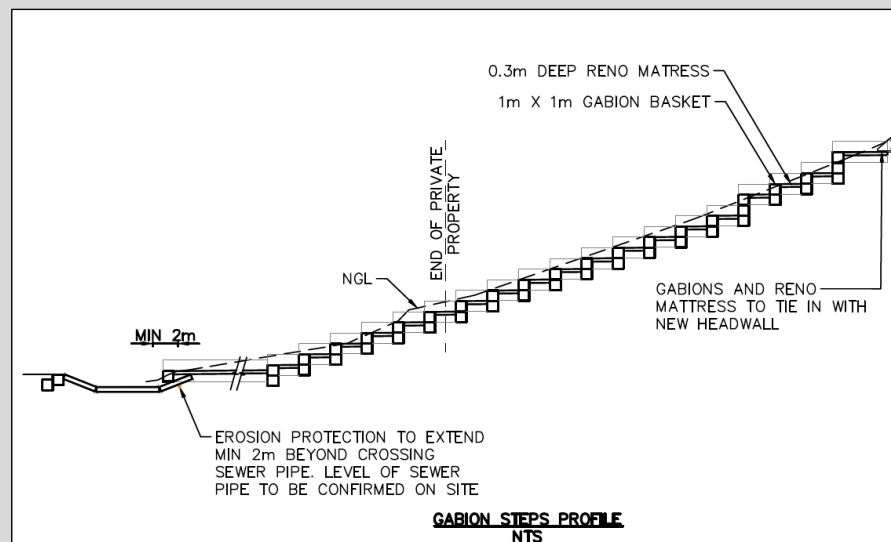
Erosion protection layout for Erven 326 & 318 – subsoil drains, gabion basket and reno mattress (source: EAS Infrastructure Engineers).
